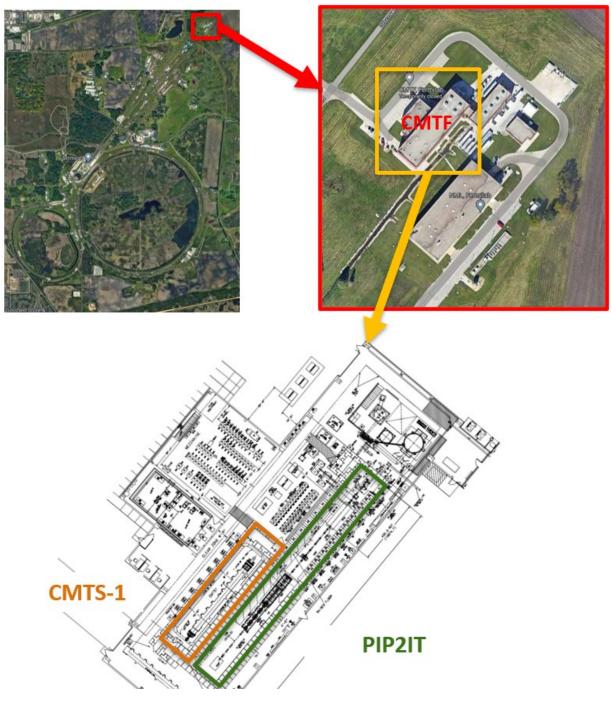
Aerial view of the Fermilab site, indicating the location of PIP2IT.
